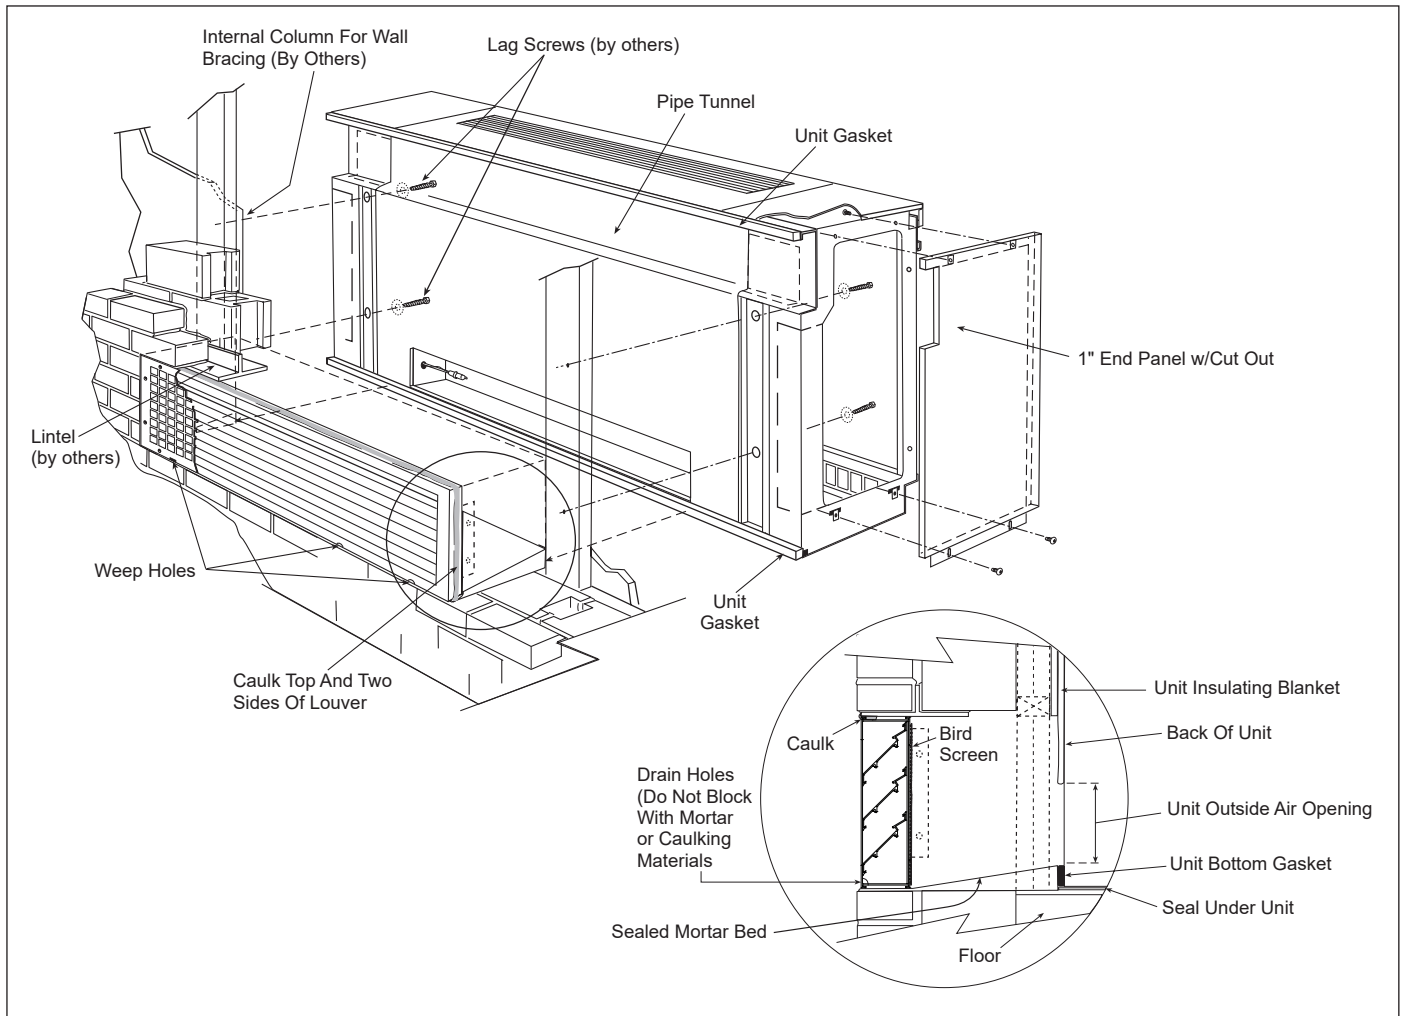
Typical Classroom Unit Ventilator Installation and Louver Details
